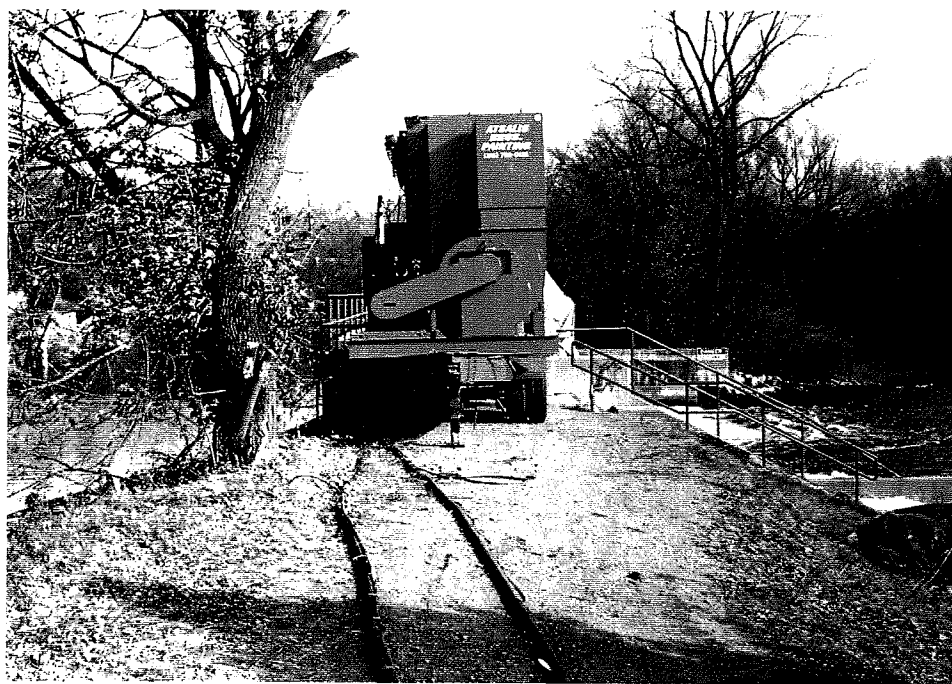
Crest of right embankment. New stairway and railing can be seen. Painting contractors equipment can also be seen. Nov. '92
